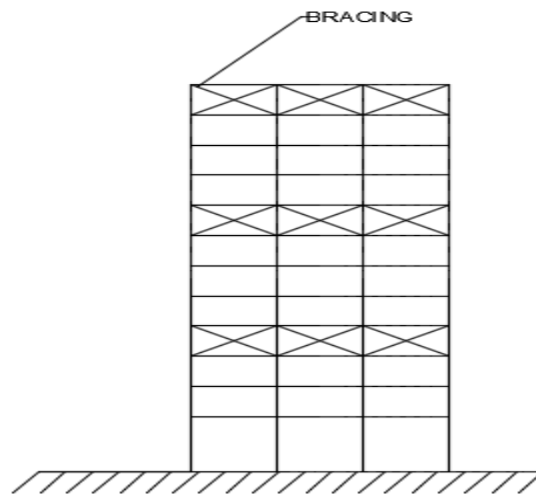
Tall building with belt trusses as “virtual” outriggers
